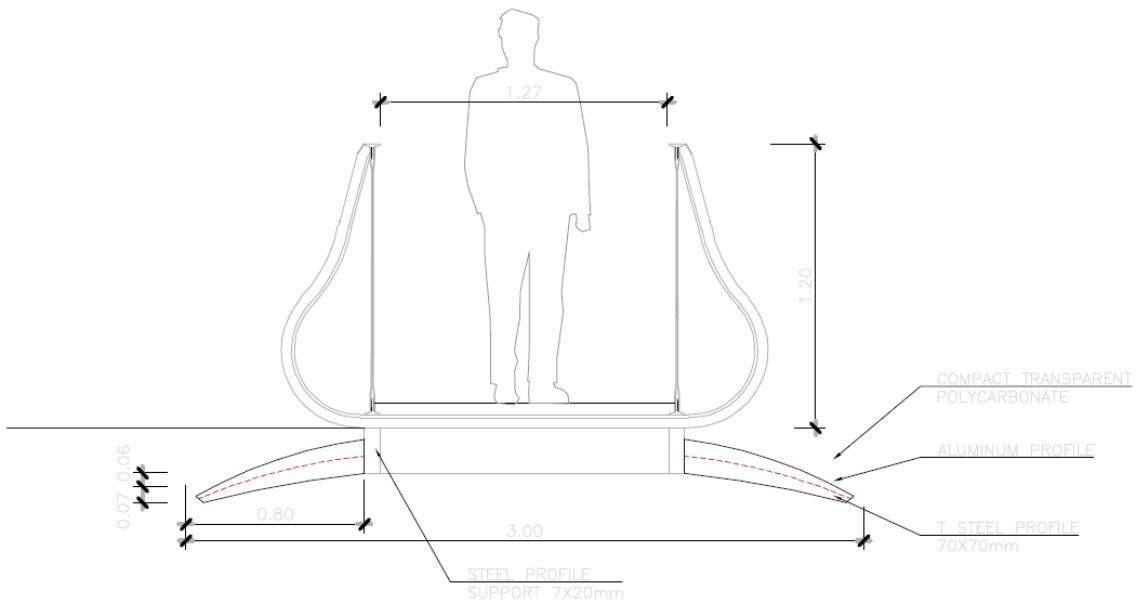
Proposed parapet solution at OBG12 Clonsilla station footbridge - section
